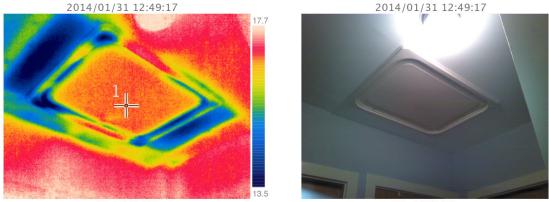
Significant cold areas at ceiling and external wall junction in first floor bathroom.
